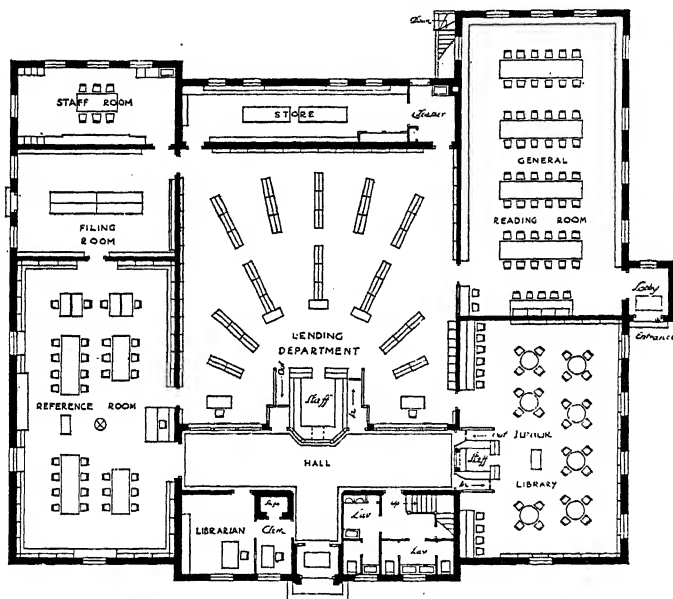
Watford Public Library, Ground Floor Plan (Section 175).
